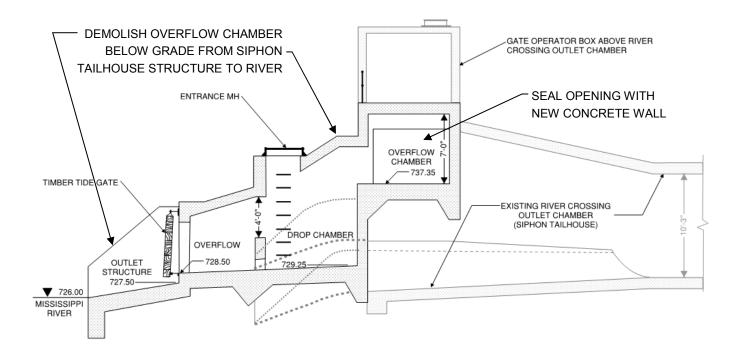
Siphon Tailhouse Chamber Section View I
